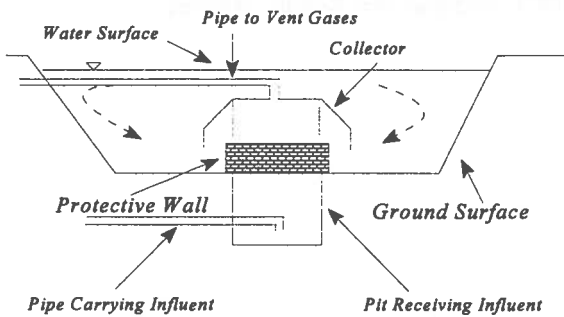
Wastewater Stabilization Pond with Gas Collector
